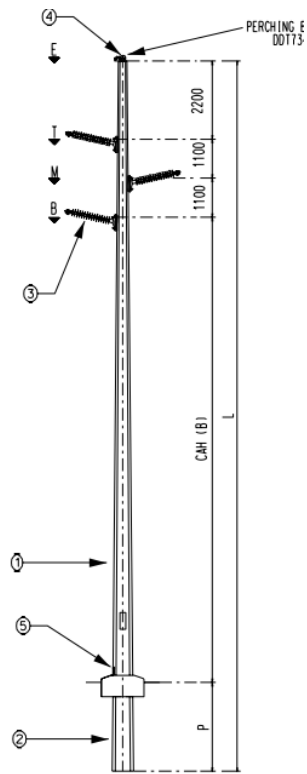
Steel / Concrete Monopole Single Circuit Structure
